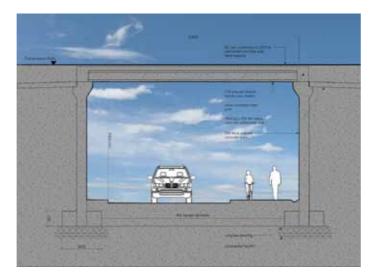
Bridge 1:SH1 Underpass - cross section
